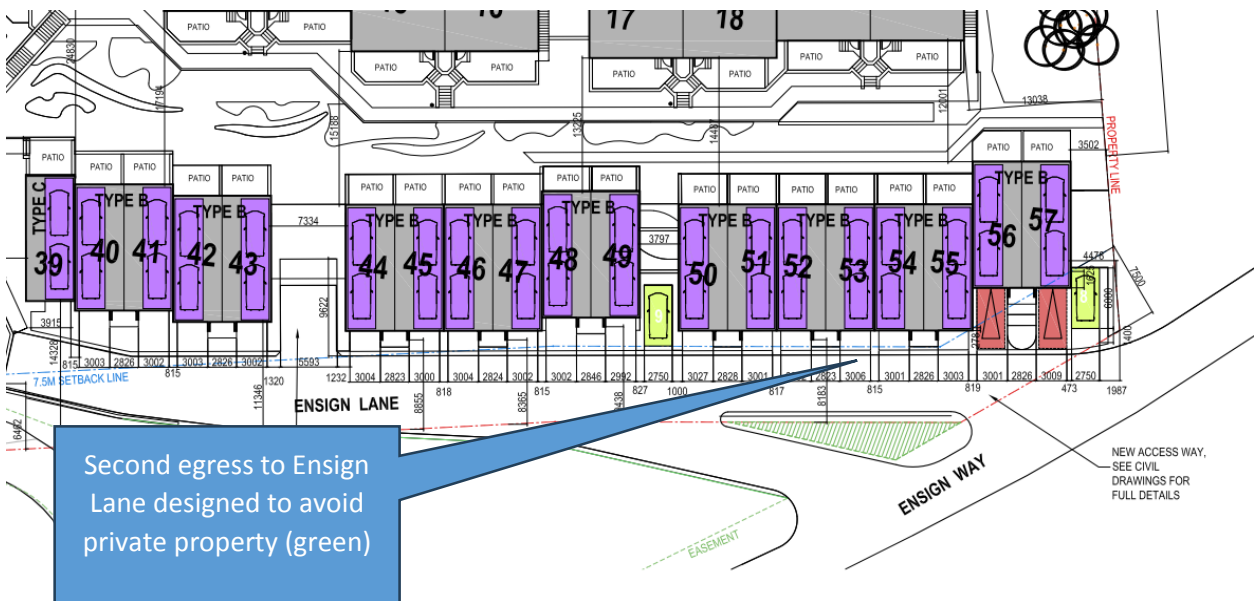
New laneway access to circumvent trespass on adjacent private property.
